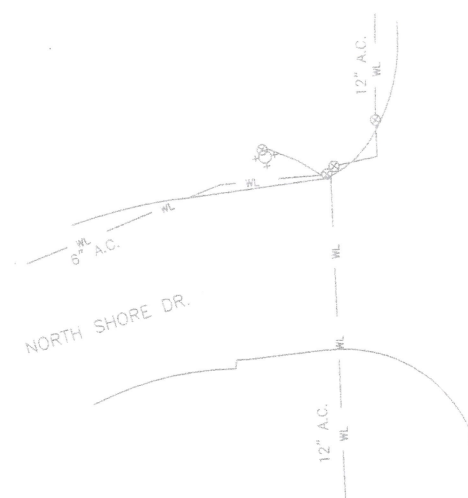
DETAIL A: NORTH SHORE DRIVE – AIRPORT ROAD DETAILS
